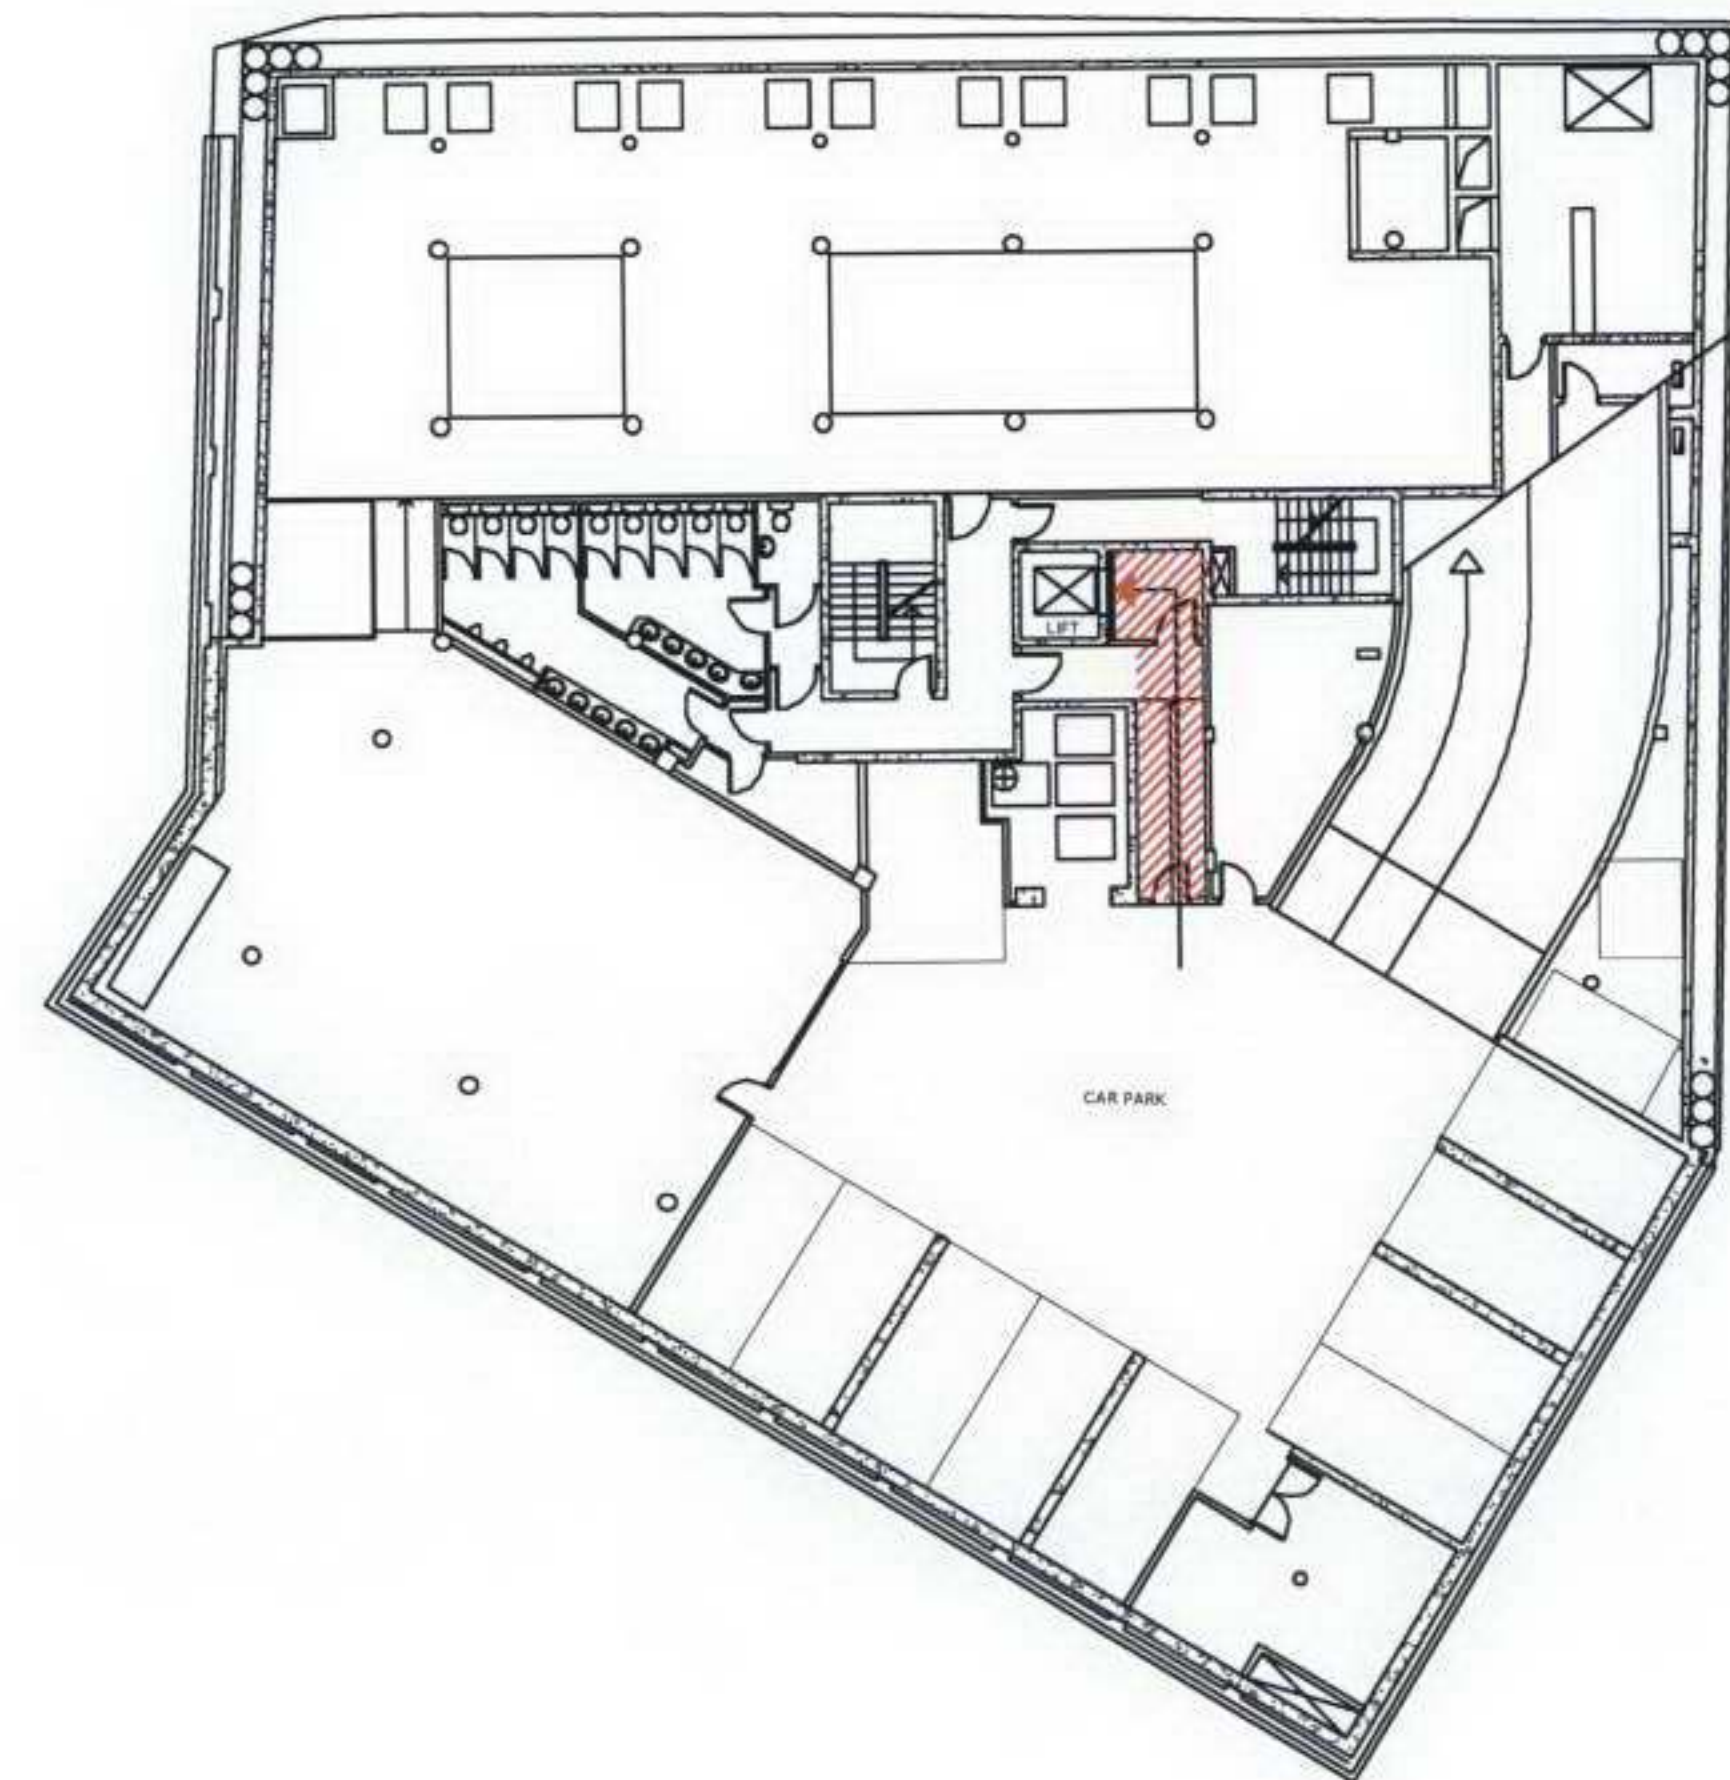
Basement plan of the existing building at 55 Holmes Road showing the parking and lift access.
